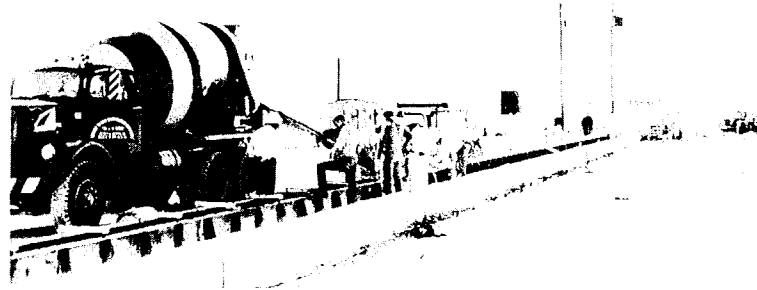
Placing concrete in forms of 18"x18" precast, prestressed concrete piles 95' in length. Prestressed bed 500' in length. Ross Anglin and Son, General Contractors, San Antonio, Texas.
